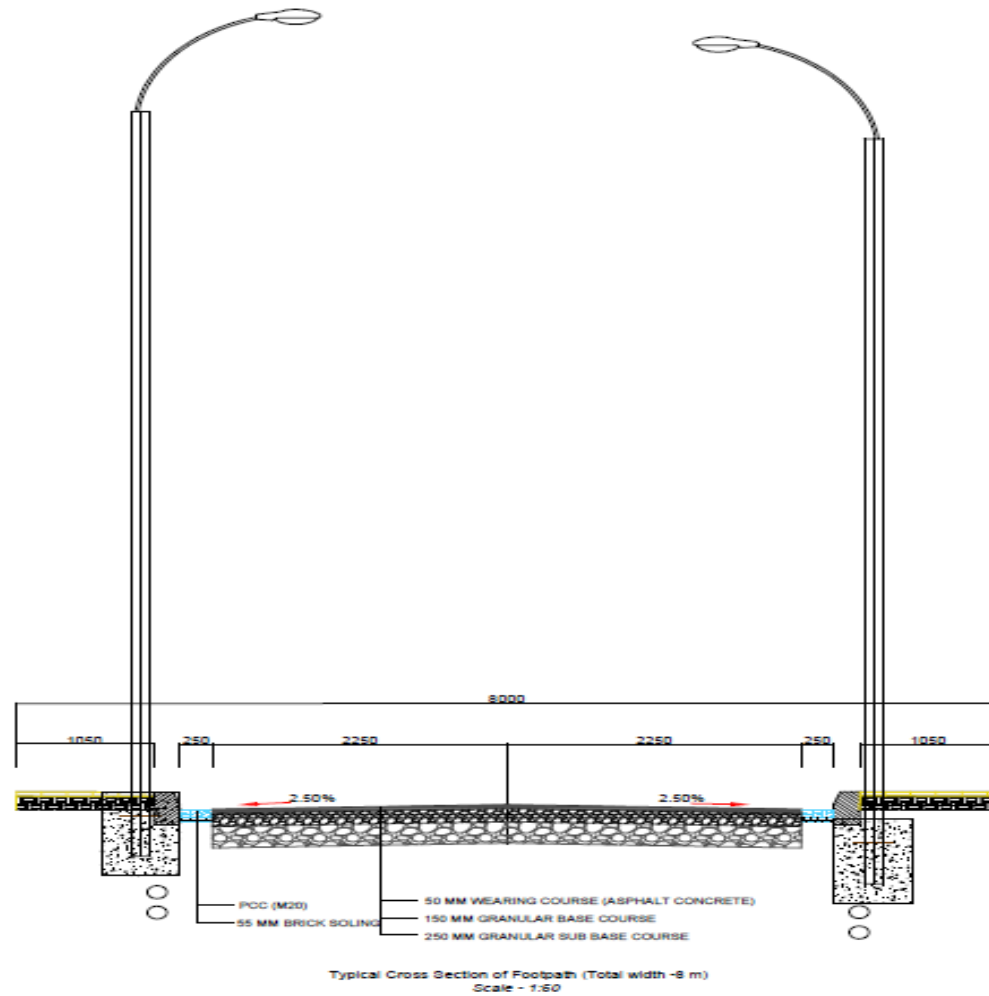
Typical Road Section with Street Light in Siddharthanagar
